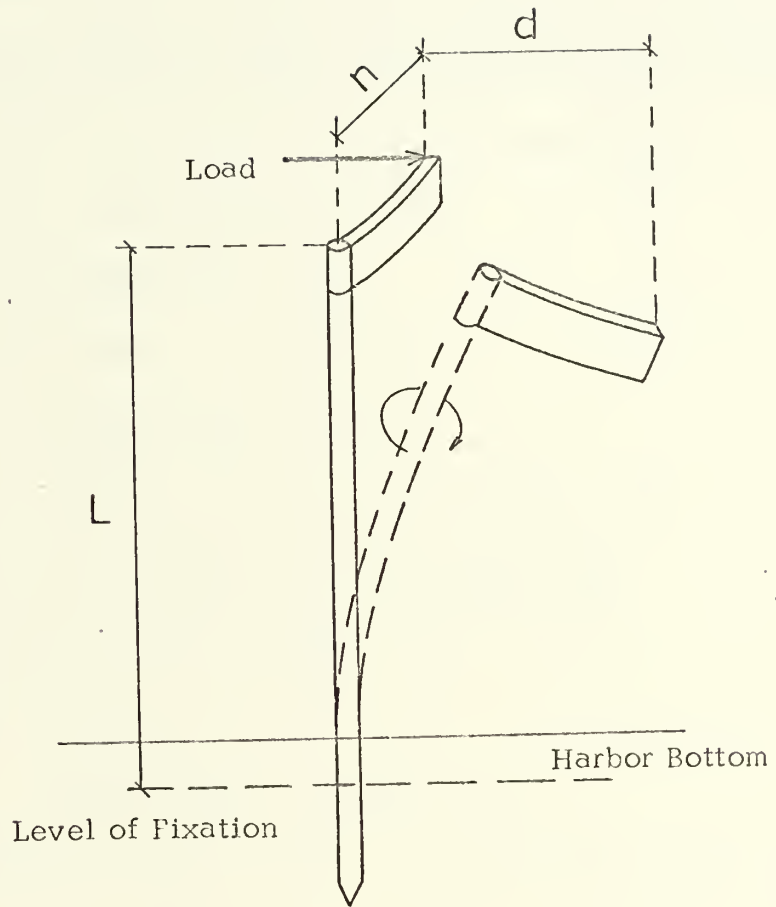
LONG CANTILEVER PILE WORKING IN TORSION
